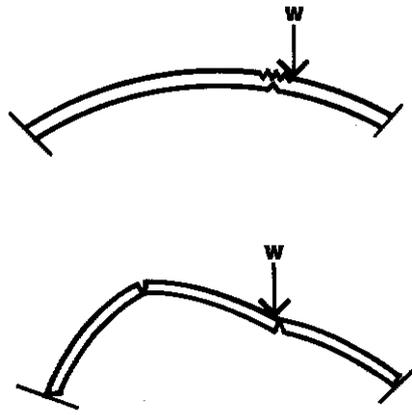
The failure of a masonry (voissoir) arch
